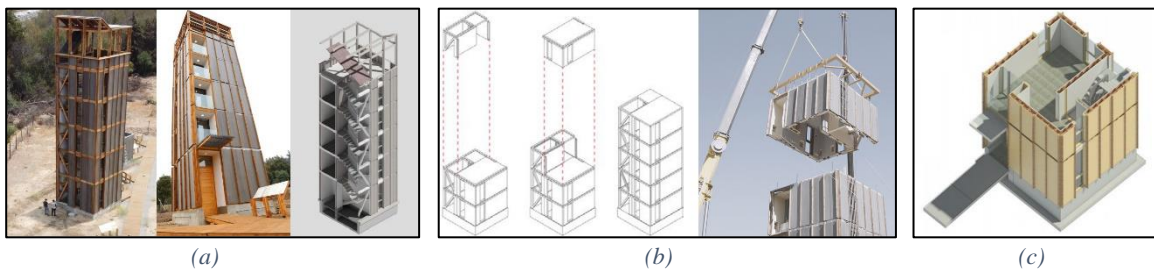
Peñuelas' Tower: (a) Global view of the Tower; (b) Modules assembly process; (c) Section of the Tower
